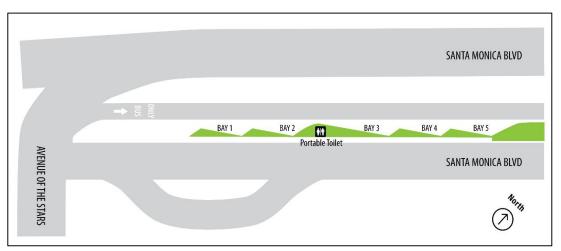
Temporary Santa Monica Boulevard Bus Layover Design
